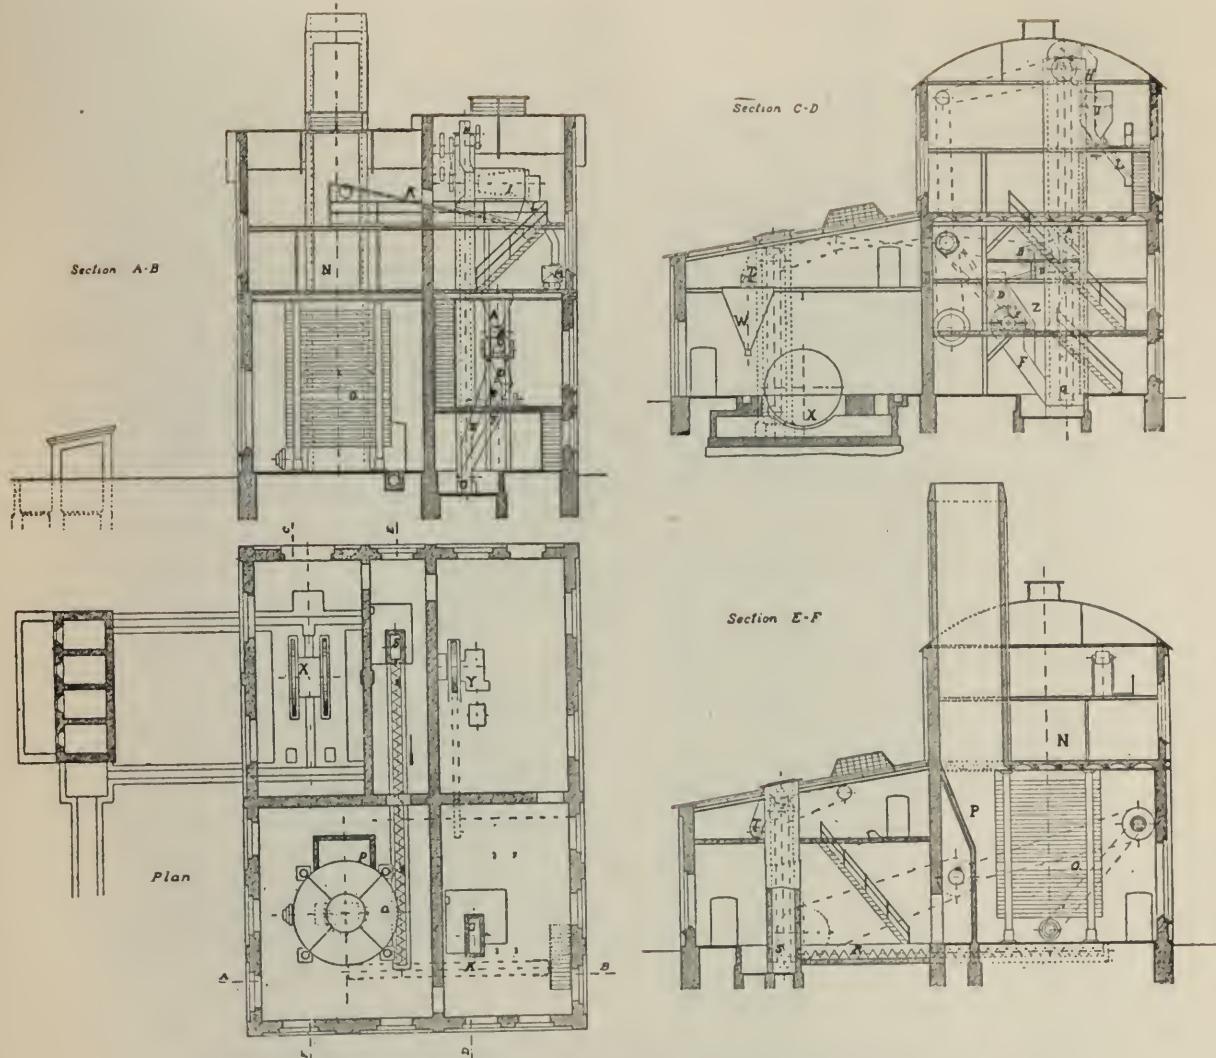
Peat Briquetting Plant with One Press and Steamplate Drier.
